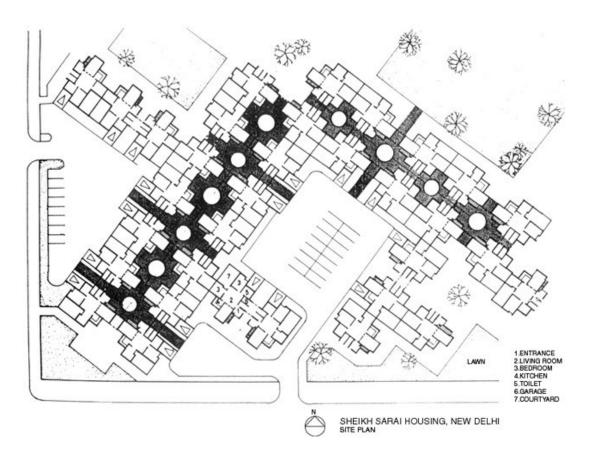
Site Plan of Sheikh Sarai Housing Complex
